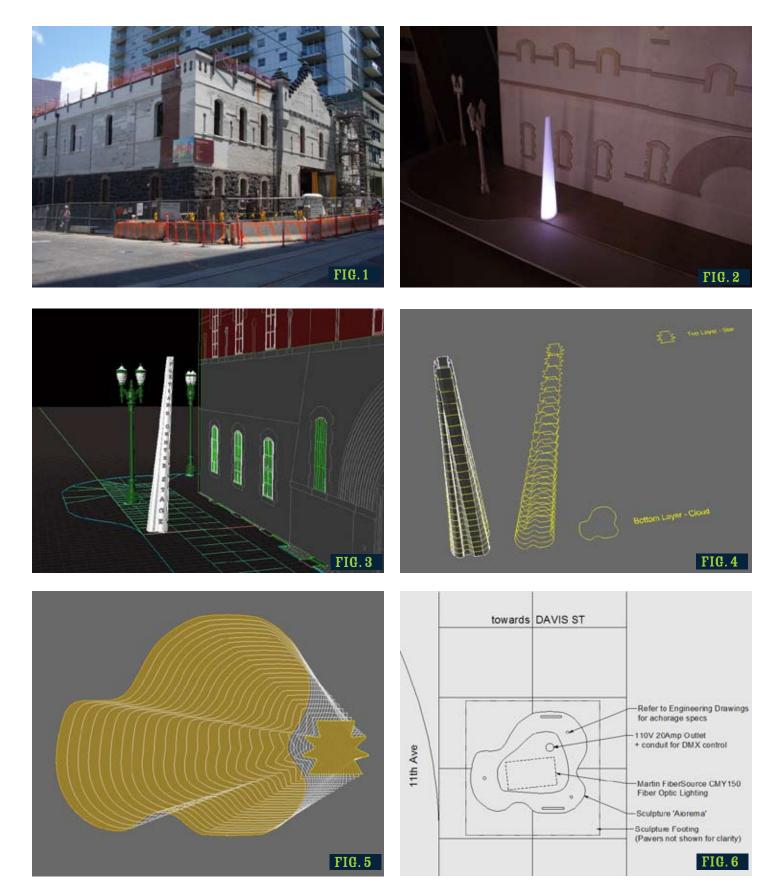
Photo of Armory Building site. Fig 2- Model showing 'light beacon' idea. Fig 3- first computer rendering of concept. Fig 4- drawing showing how sculpture is built from stacked sections of material. Fig 5- Plan view depicting change from 'cloud' at base to 'star' at top. Fig 6- Sculpture in relation to sidewalk.
